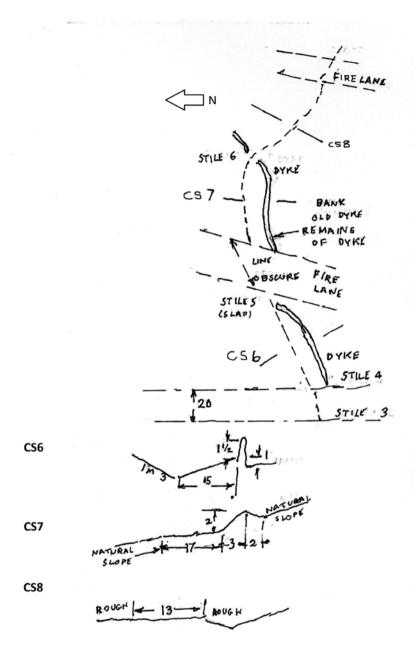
Nine stiles walk – sketch plan with cross sections 6–8 (not to scale).
